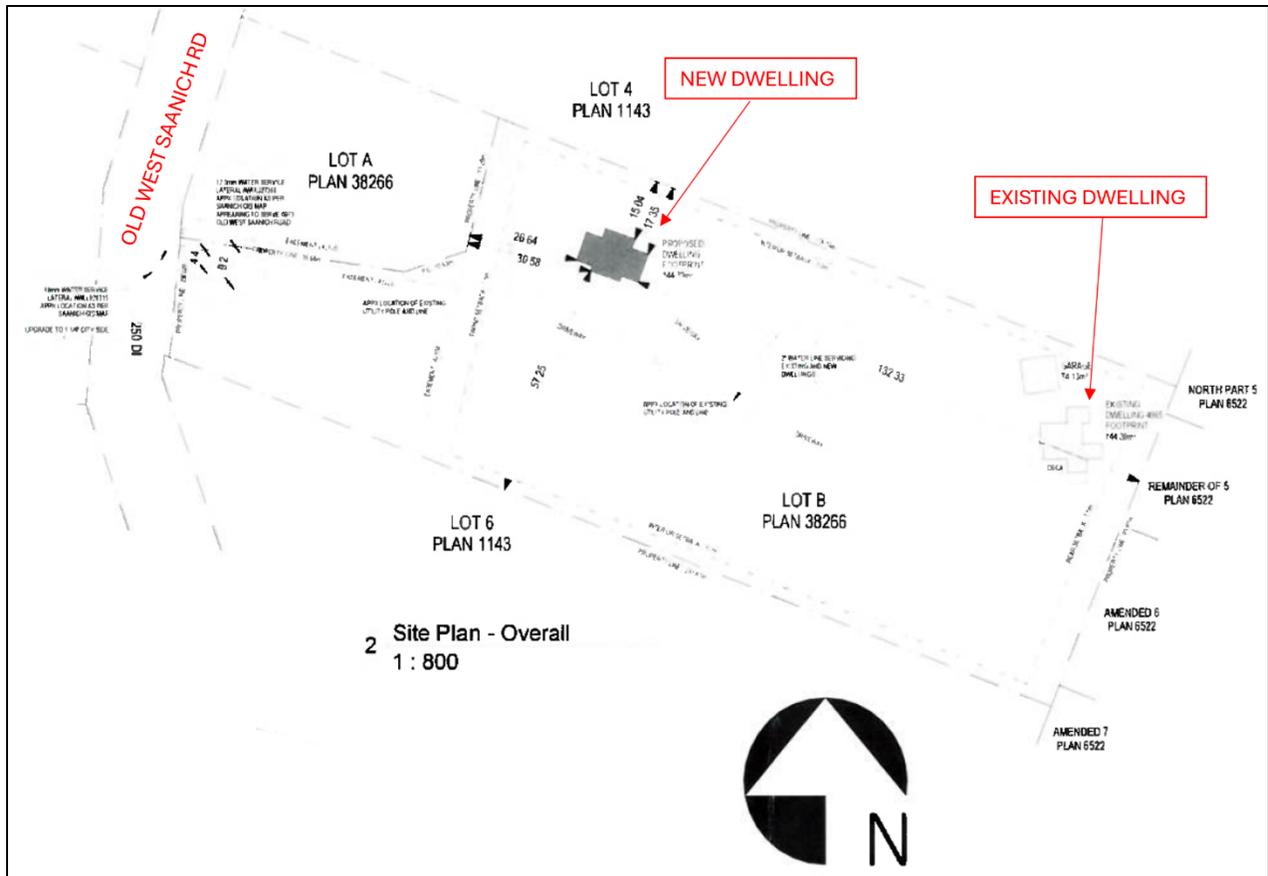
Site Plan (by Merge Design Studio, annotated by staff)
